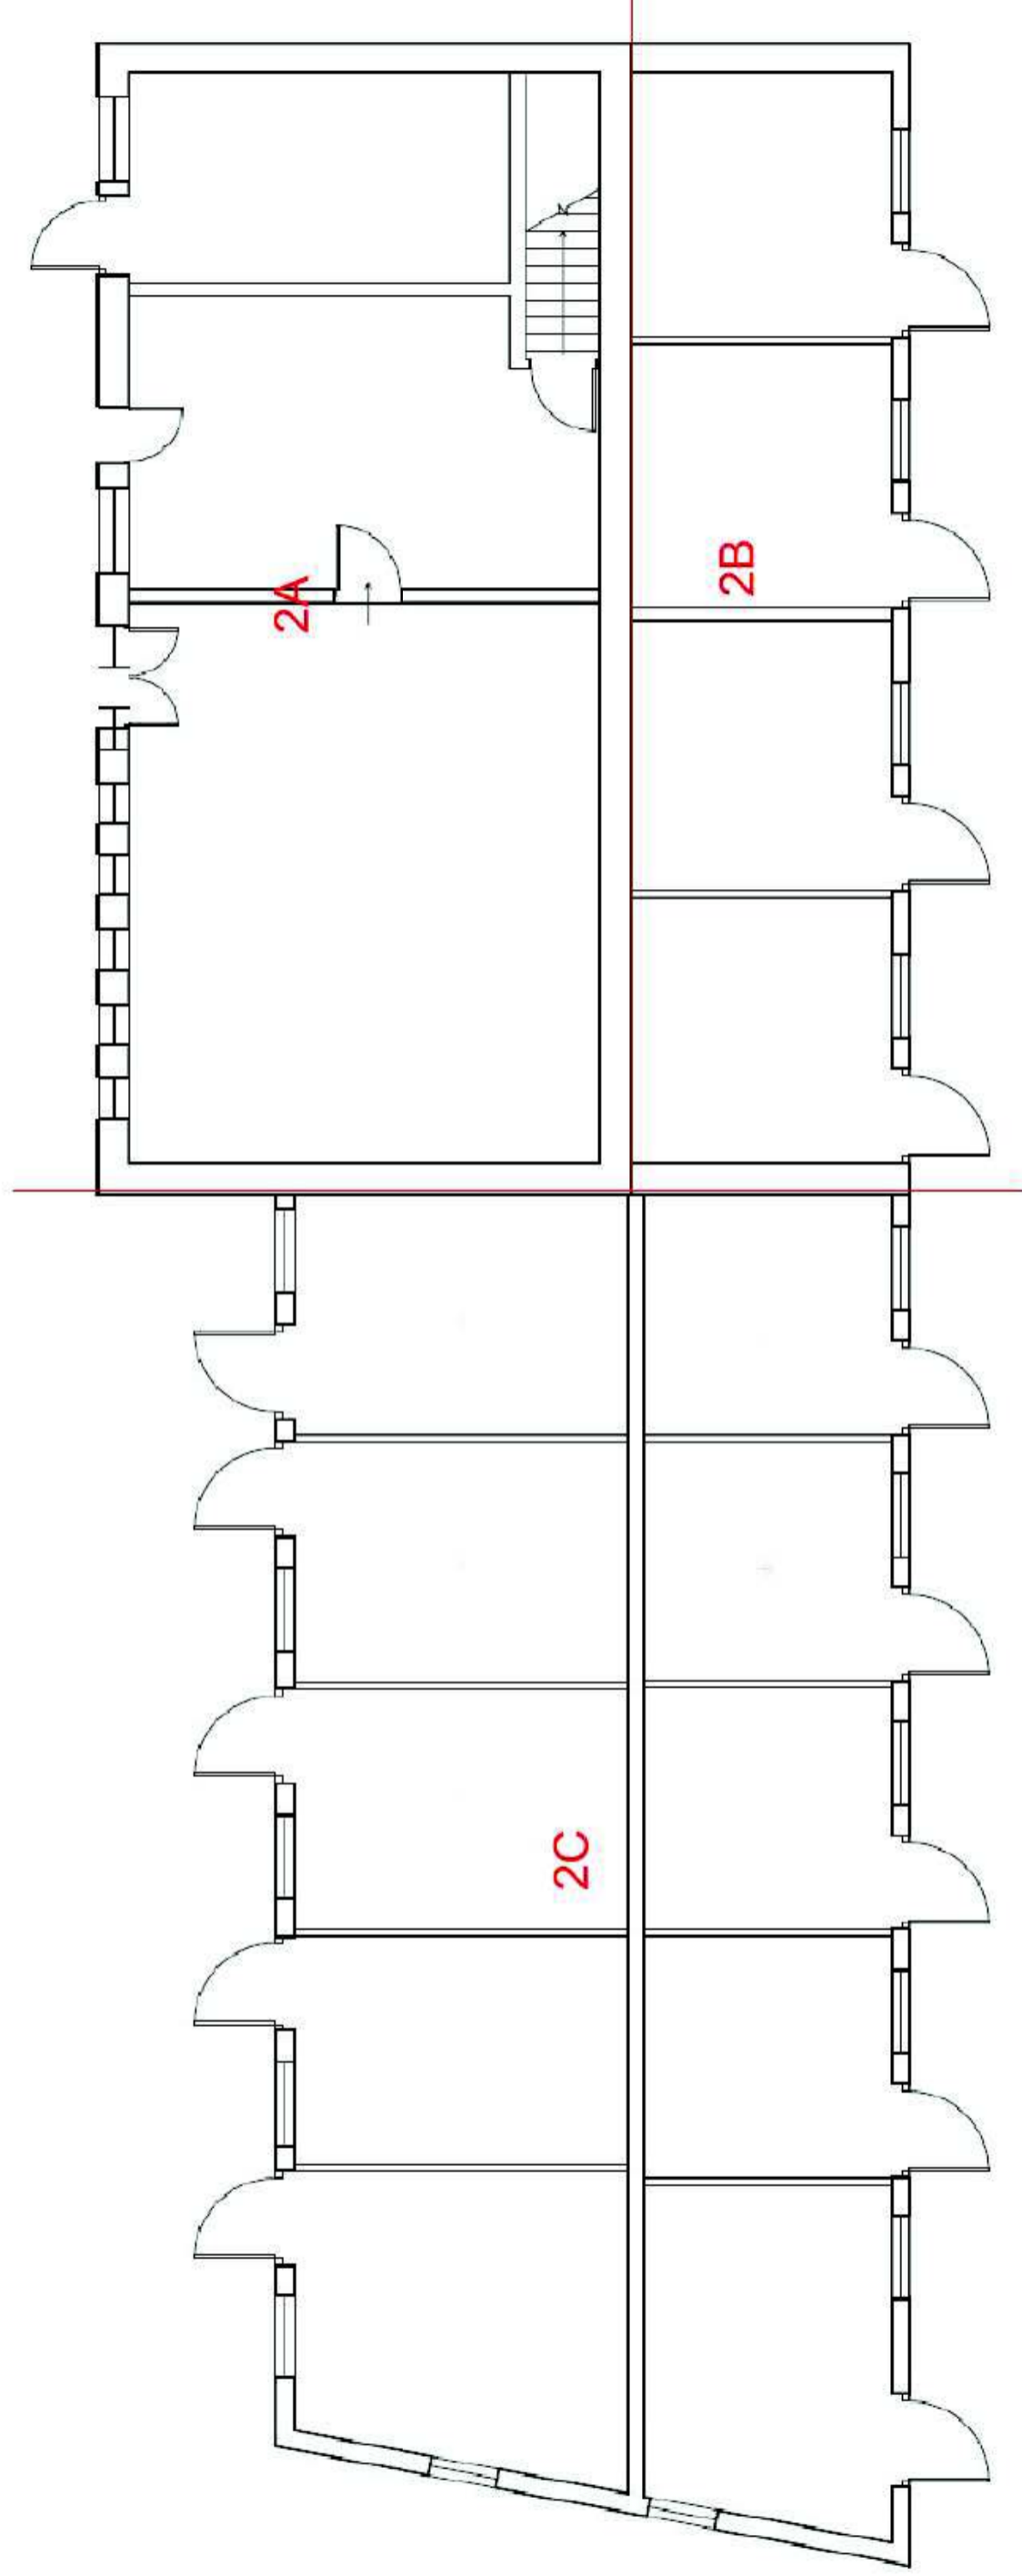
Ground Floor Plan, building 2, 1:100 @ A3
